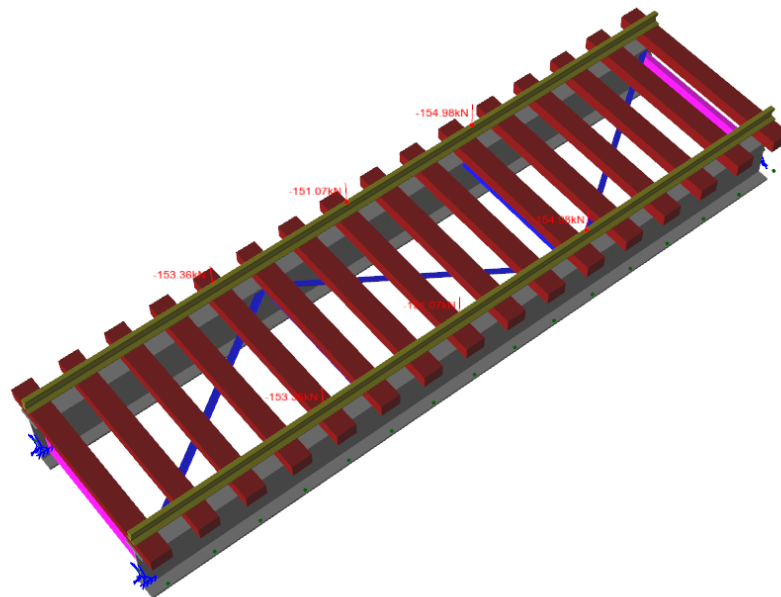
Model 2: A Single-Span Bridge–Track Model (a Snapshot)
